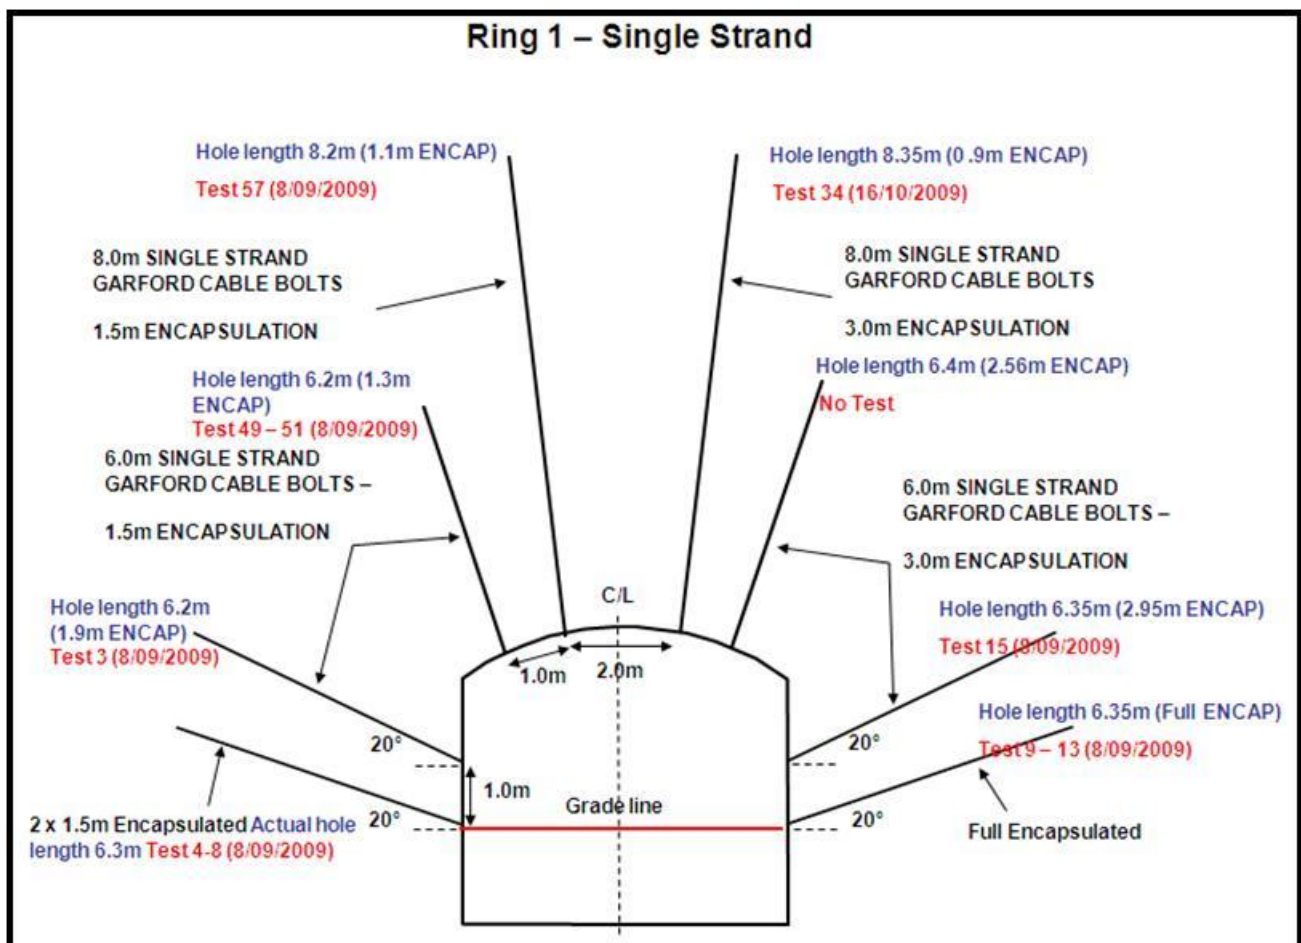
Schematic illustrating single strand cable bolt calibration set-up.
